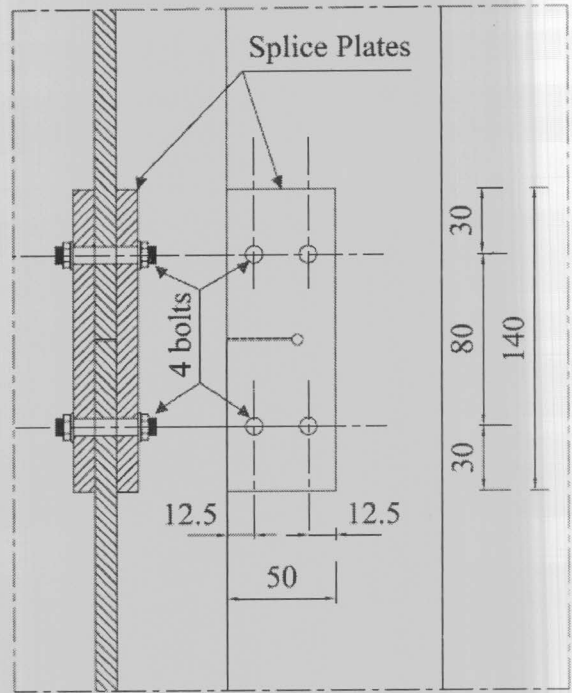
Details for specimen S7, the crack tip is blunted with a 5 mm hole followed by splicing the crack wake with bolted plates.
